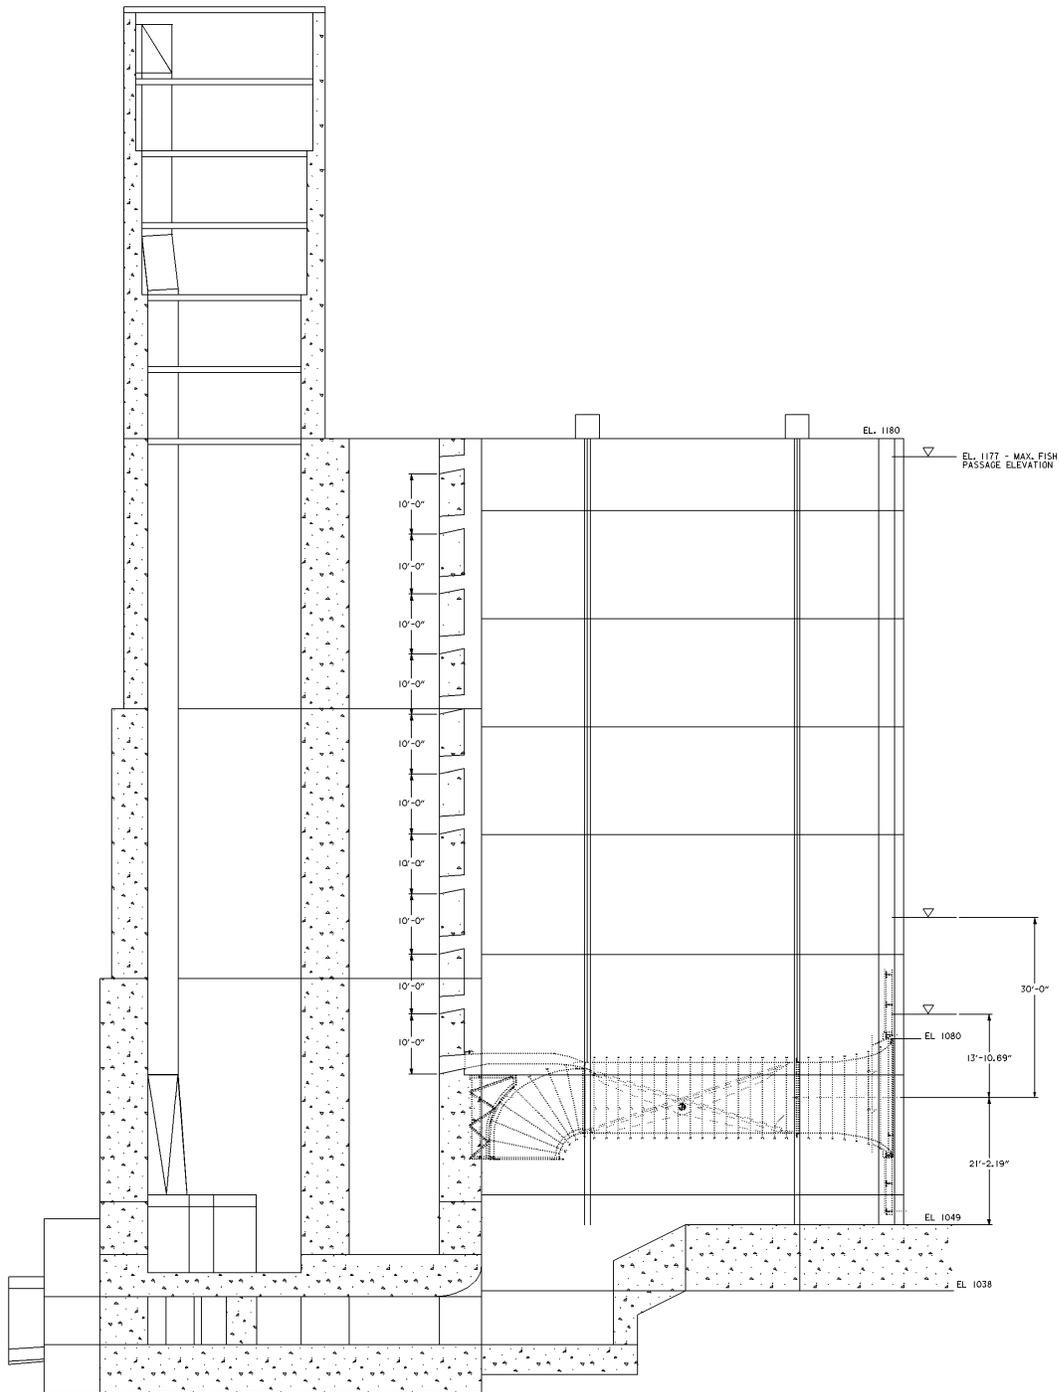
Vertical Cross Section of the Fish Passage Structure, Howard Hanson Dam, Green River, King County Washington. Elevations noted are in relation to the existing reservoir, which has a minimum operating elevation of 1070 ft.
